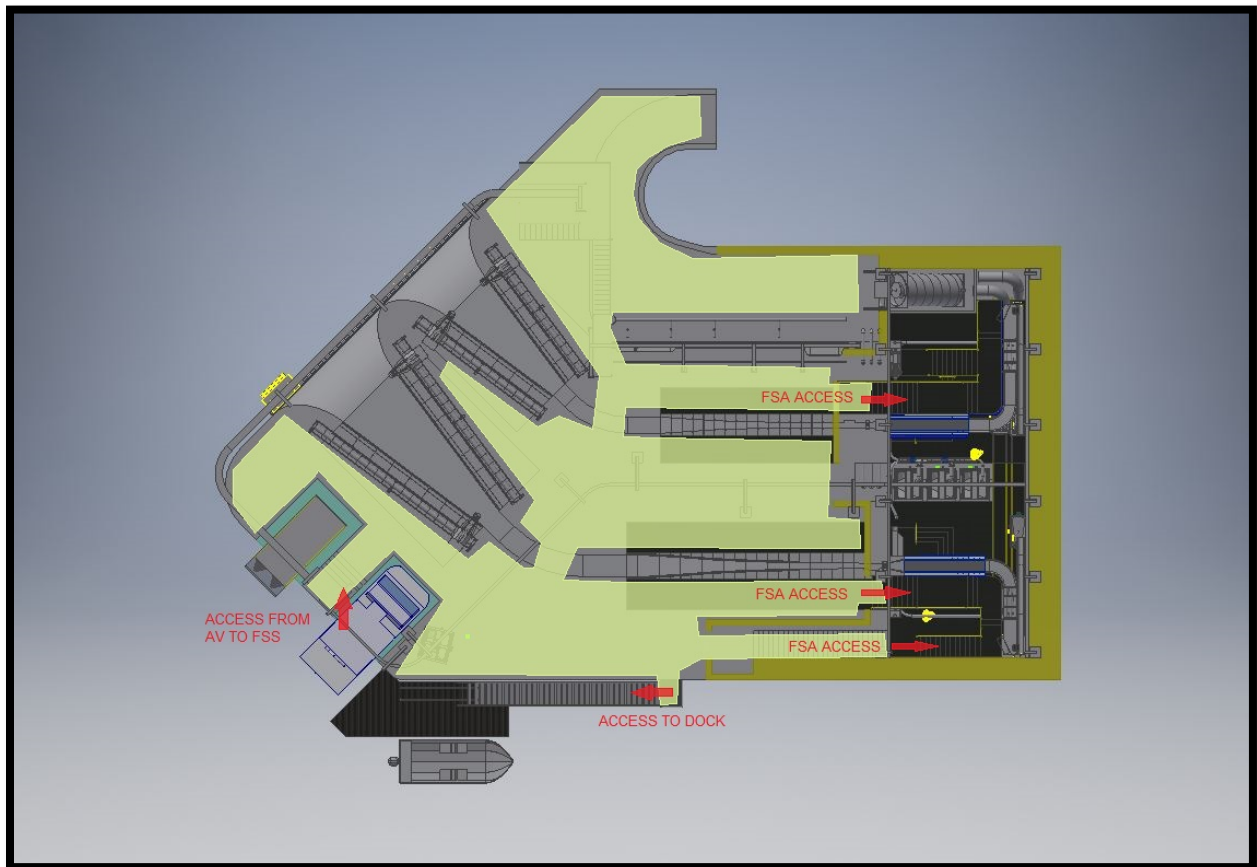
Floating Screen Structure Deck Crew Access Plan
